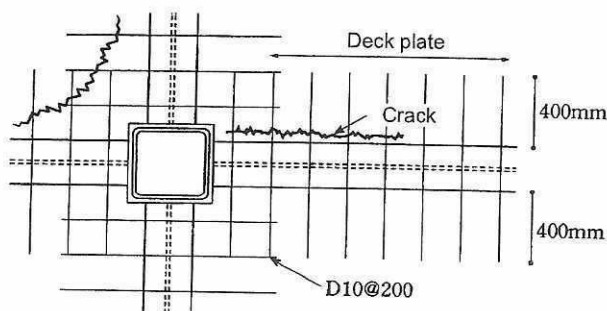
Example of additional arrangement of reinforcing bars on a beam
